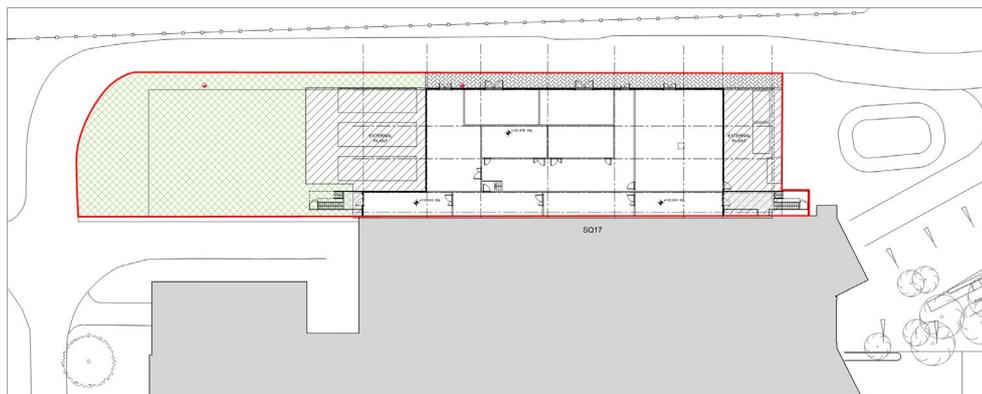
Proposed SQ17 Extension Plan – Modules 4 and 5
